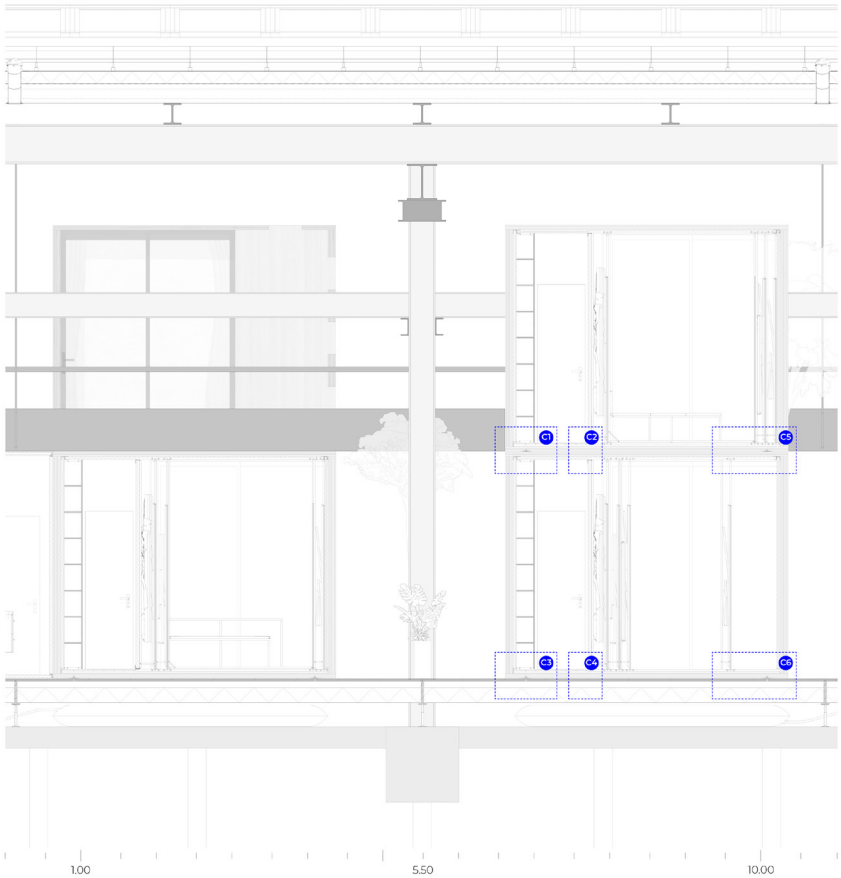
DETAIL DRAWINGS | VERTICAL SECTION B | SCALE 1:10
